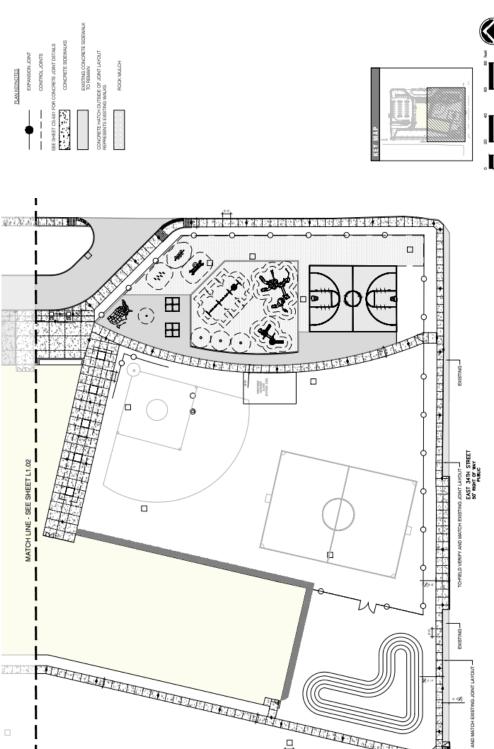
Enlarged view of the proposed playground and fence on the south side of subject site.
